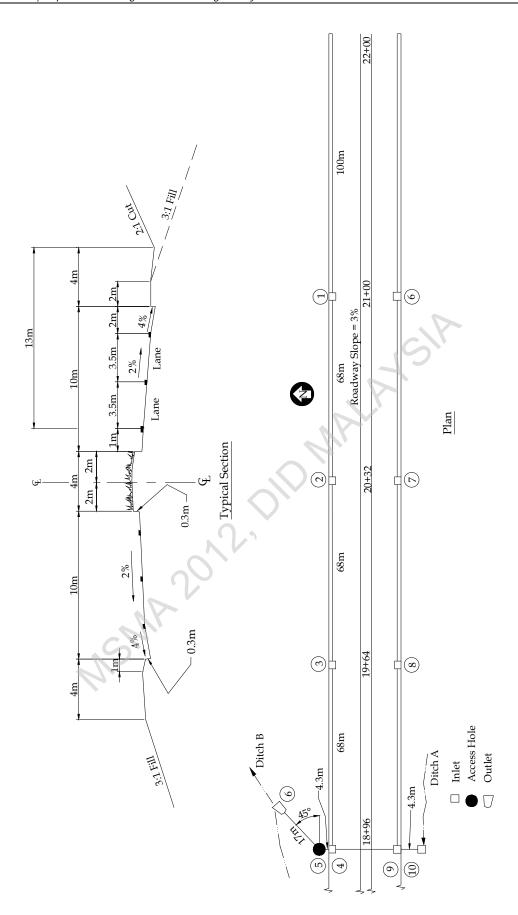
F1: Storm Drainage System for Example in Appendix 13.F
